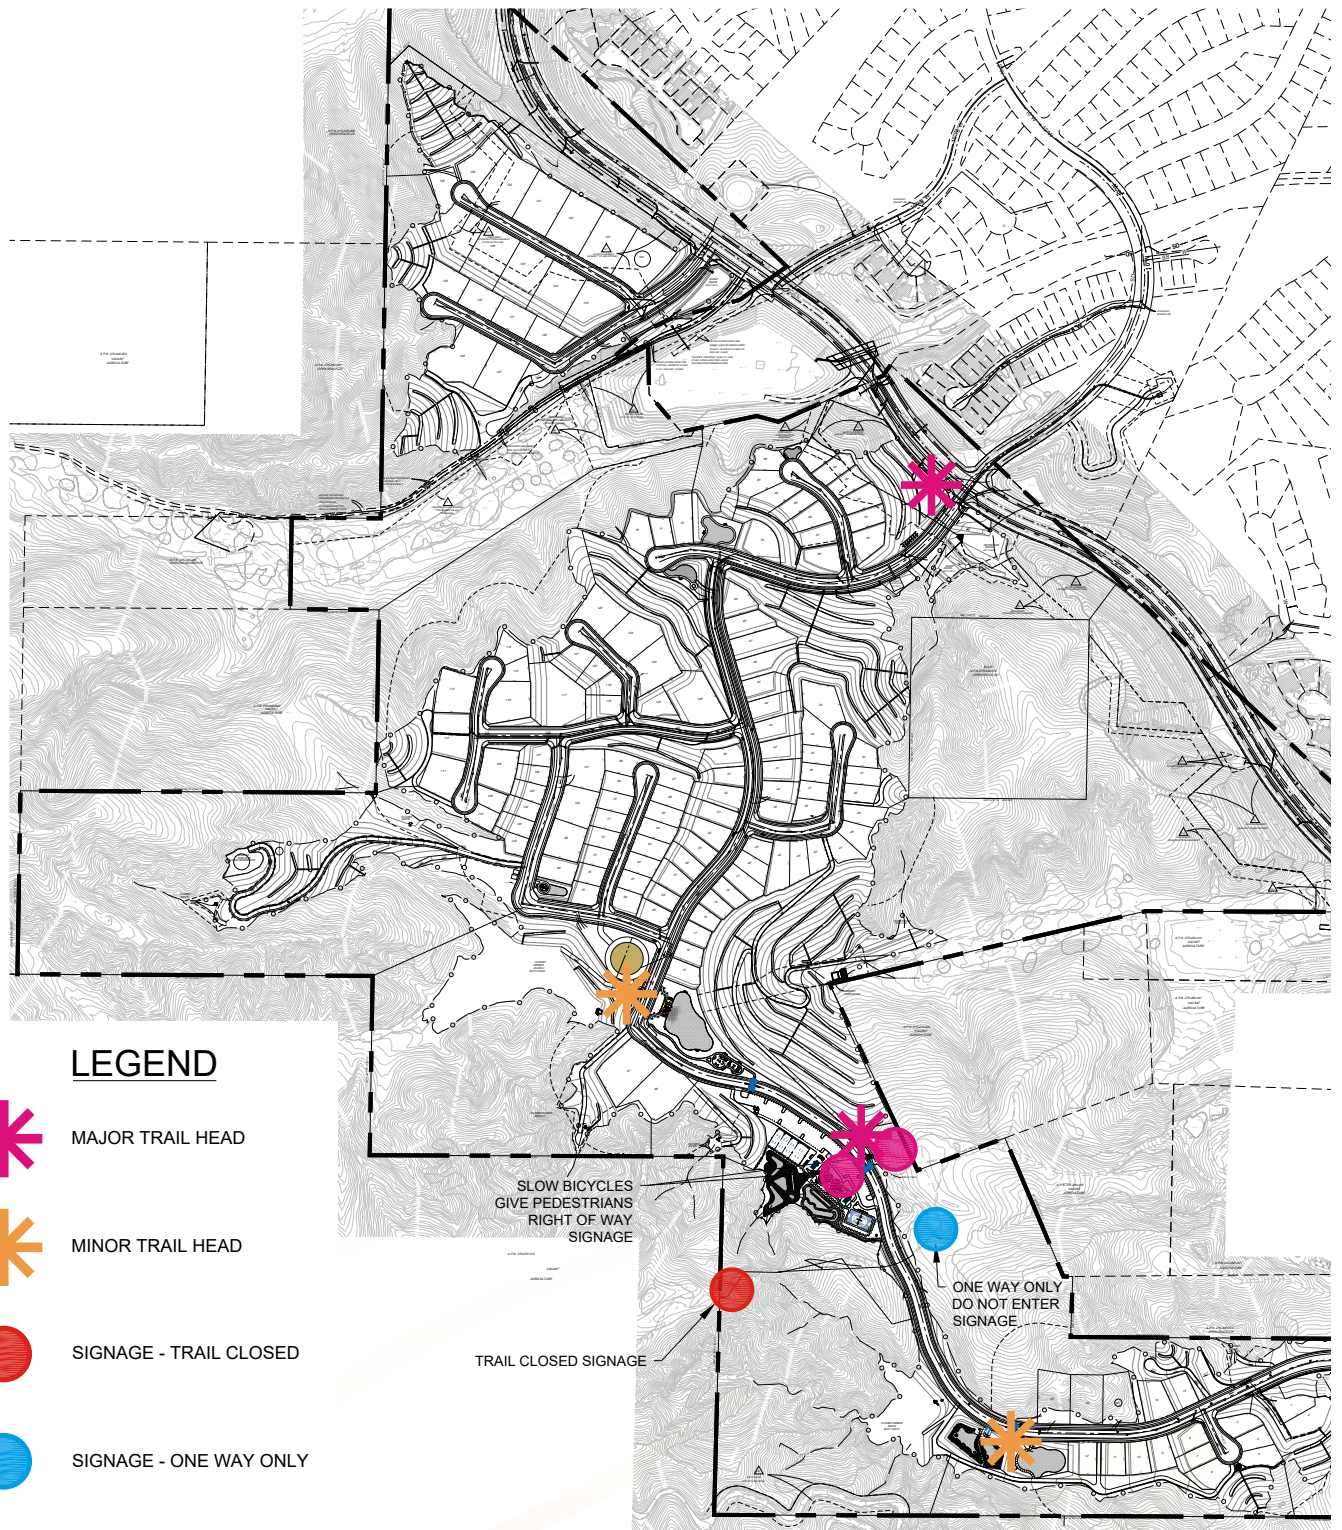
CONCEPTUAL TRAIL PLAN
